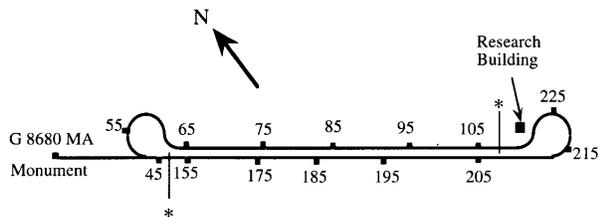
Mn/Road Test Facility (Wright County, MN) showing survey-nail locations (from Bodor et al [1]).
